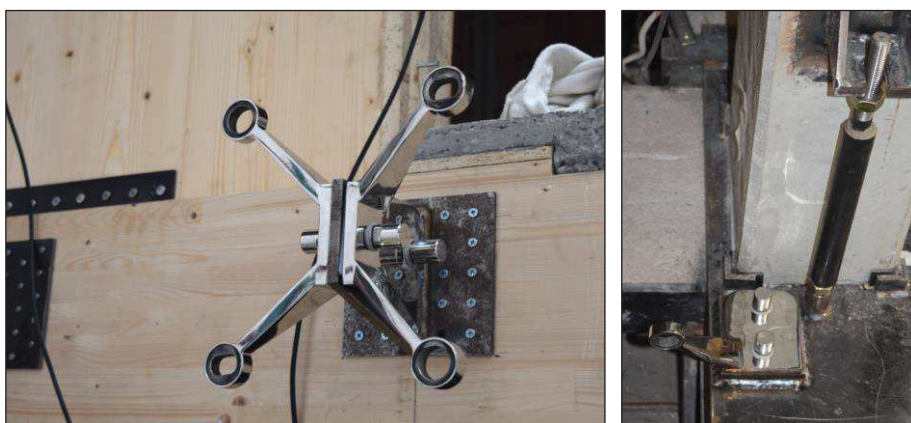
Connection of the steel plate to the edge timber beams through screws (left) and welding of the spider connectors to the specimen foundation (right).
